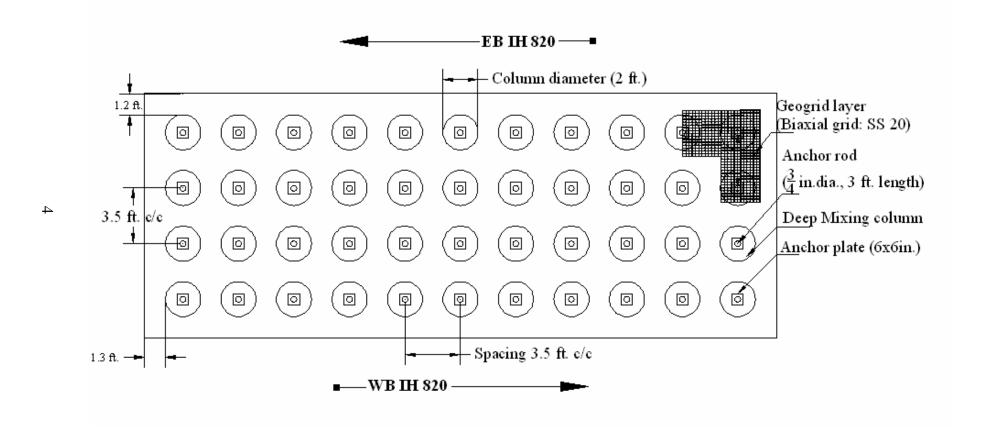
Plan View of DSM Column Layout of Test Site 1 (15 ft X 40 ft)
